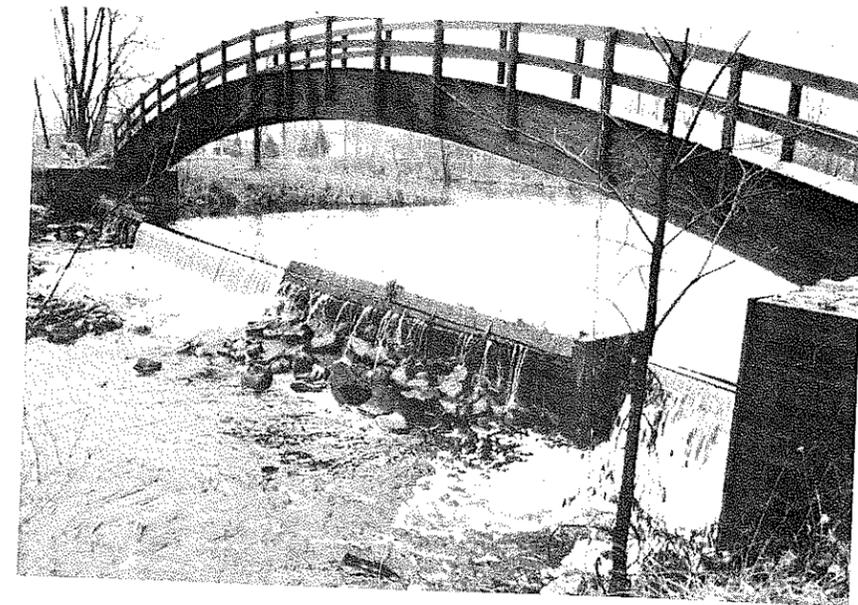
TAY ROAD DAM AND FOOTBRIDGE
